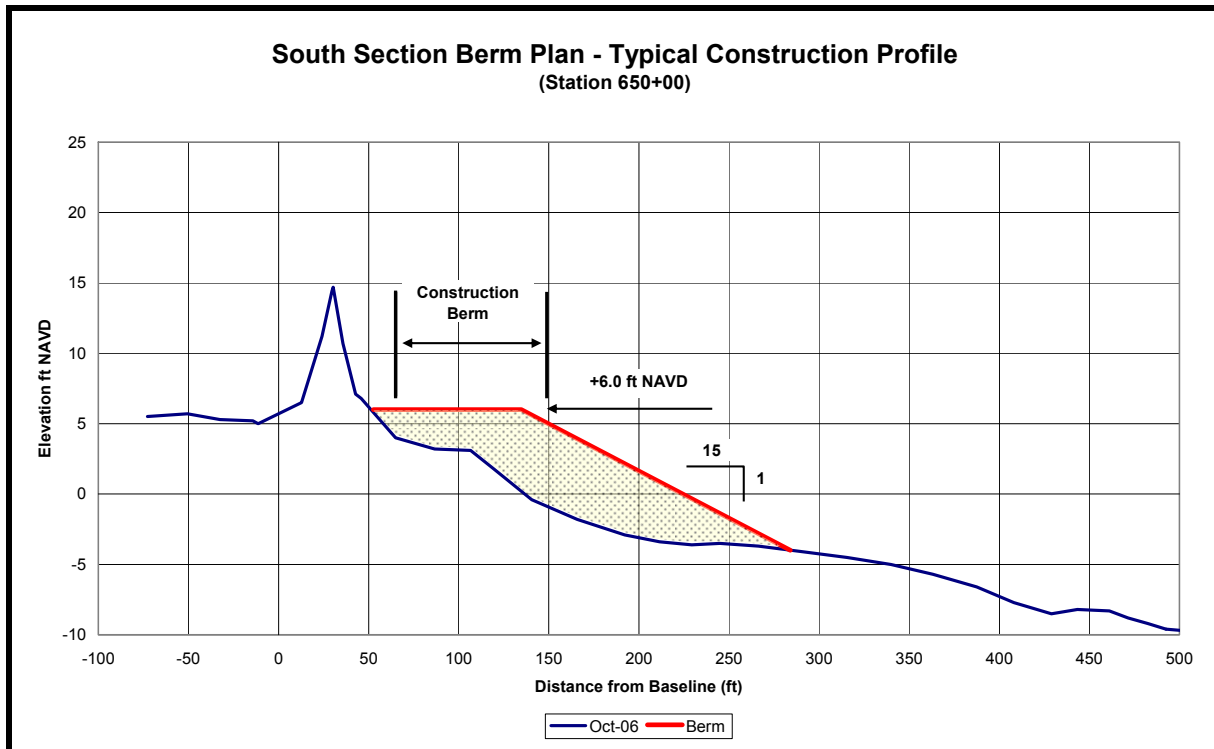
Example Cross-Section for South Section Design Fill at station 650+00.
